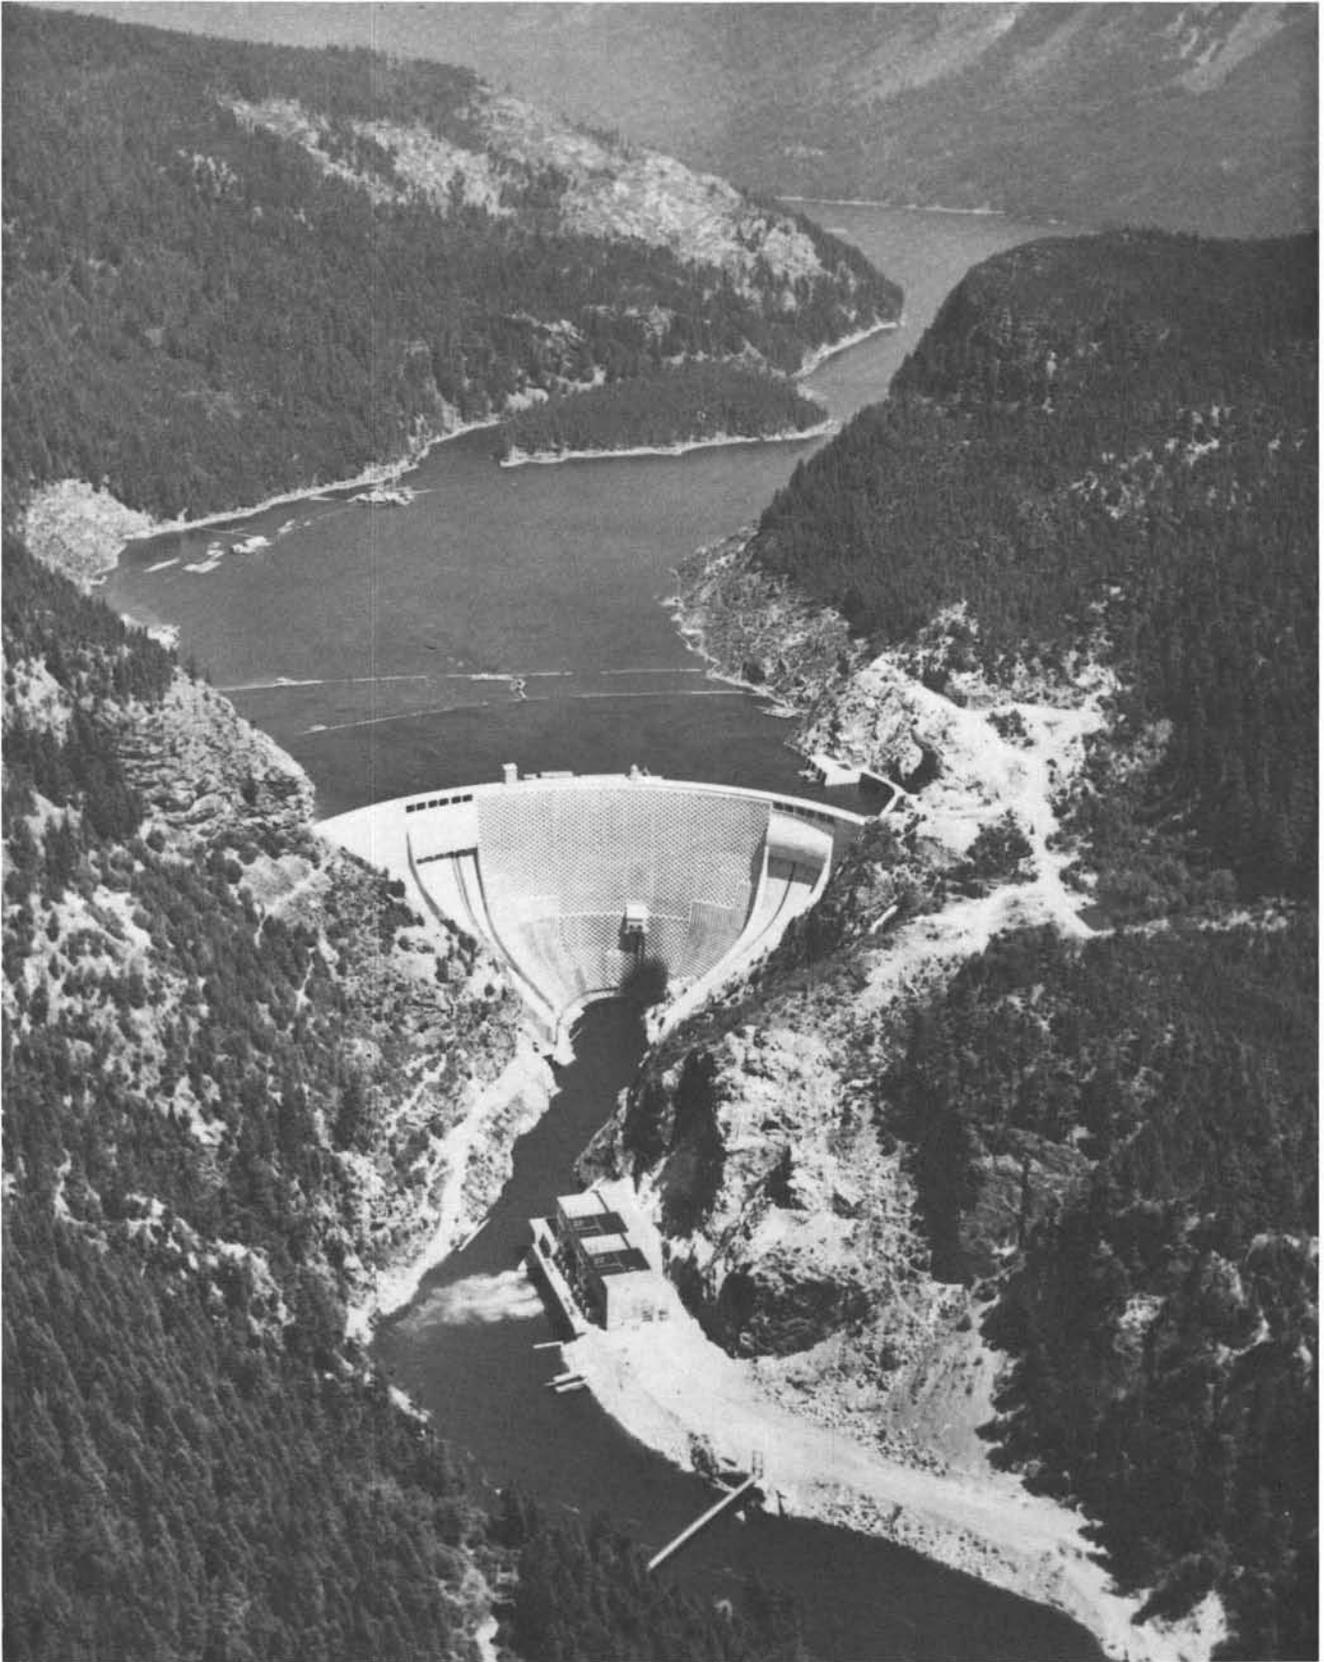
Ross Dam spillway and powerhouse. The power tunnel intake is on the right side of the dam. The "waffle iron" downstream face was designed to facilitate raising the dam. Photo by Seattle City Light.
